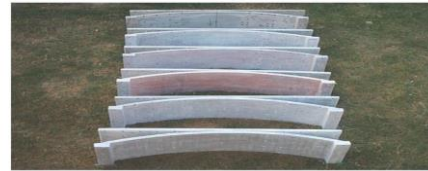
Thin Concrete Shell with Reinforcement and Flat Slab Construction
